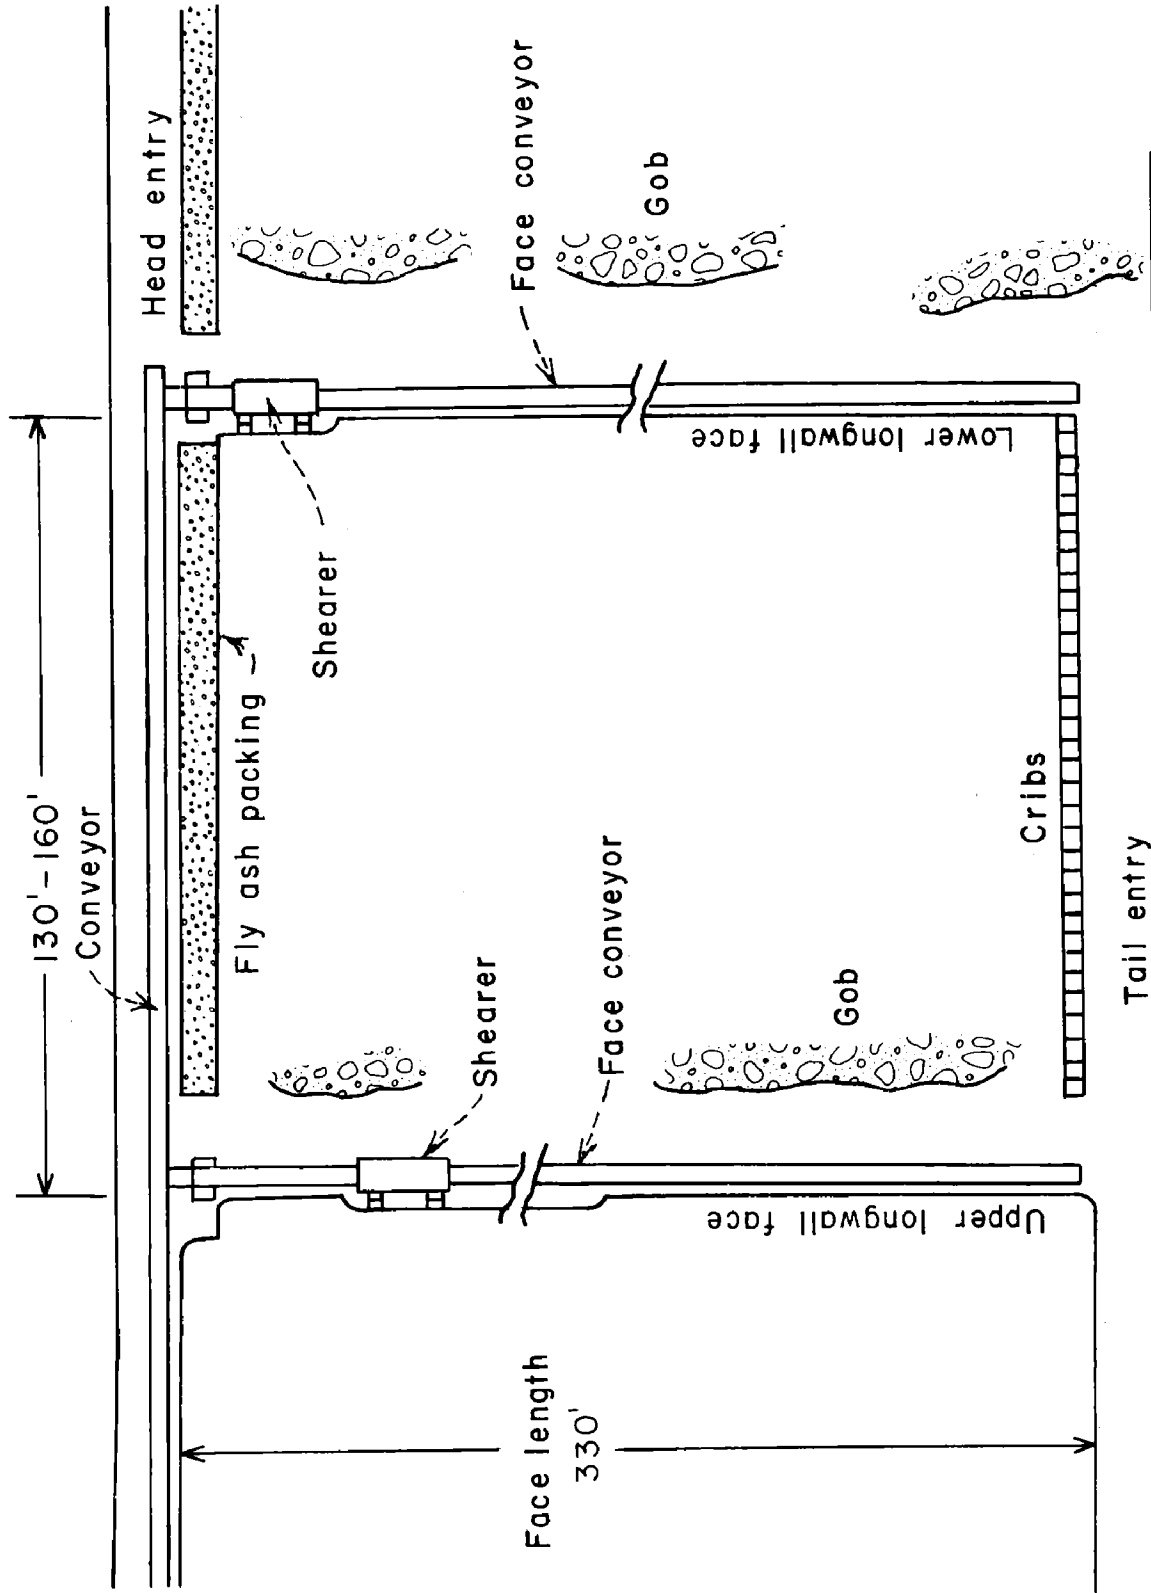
Plan view of Miyanoura mine multislice longwall operation.
